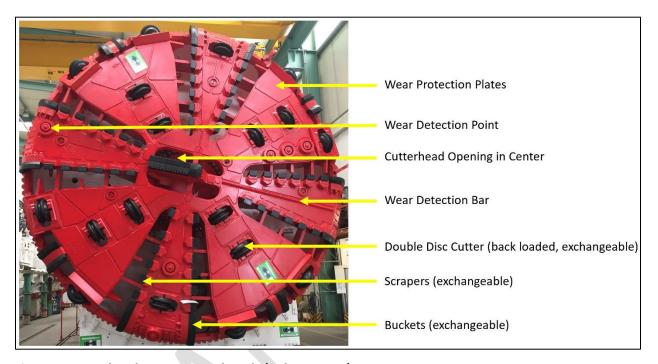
Cutterhead, Features and Tools (BabEng 2018)
